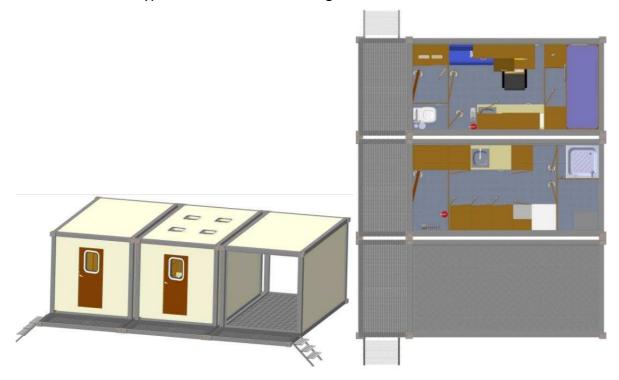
General view (A) and layout (B) of the laboratory & residential single-storey module
